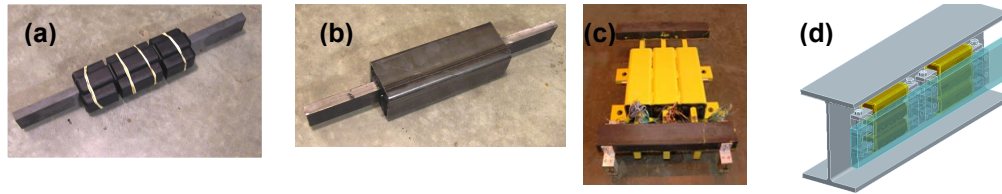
Fabrication of compressed elastomer damper: (a) elastomeric material wrapped around longitudinal bar; (b) elastomeric material and bar compressed into the steel tube; (c) damper with additional transverse attachment bars in place, and (d) installation to beam web
